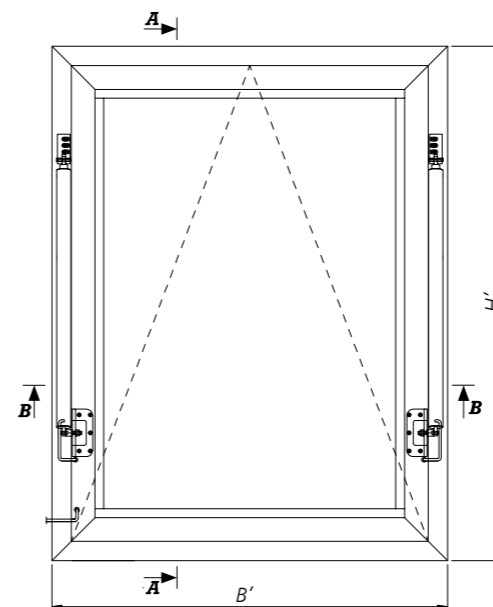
view from inside of the mcr OSO THERM 75 smoke exhaust window with S spindle actuators in closed position
